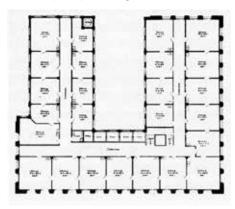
Wainwright Building plan, St. Louis, Missouri (public domain).
